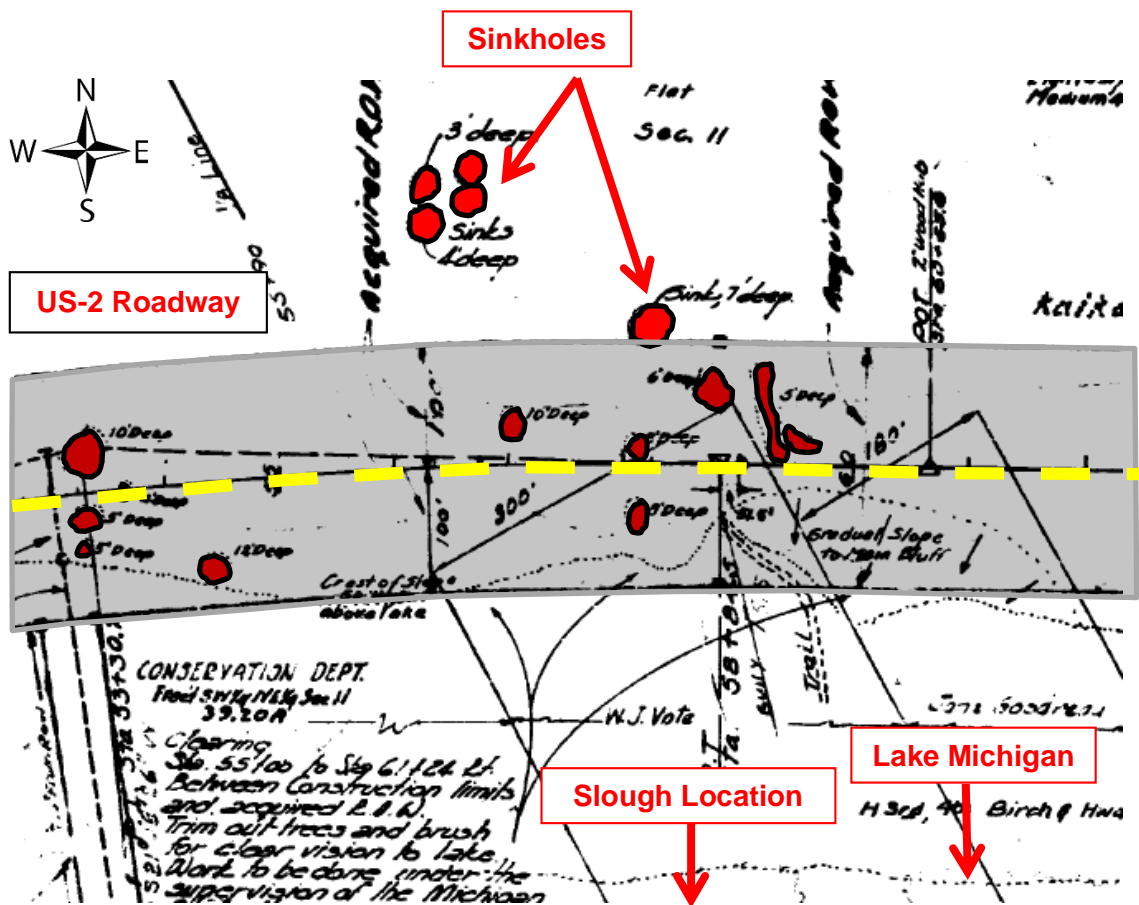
Construction drawing for the section of US-2 above the slough; sinkholes are indicated in red.
